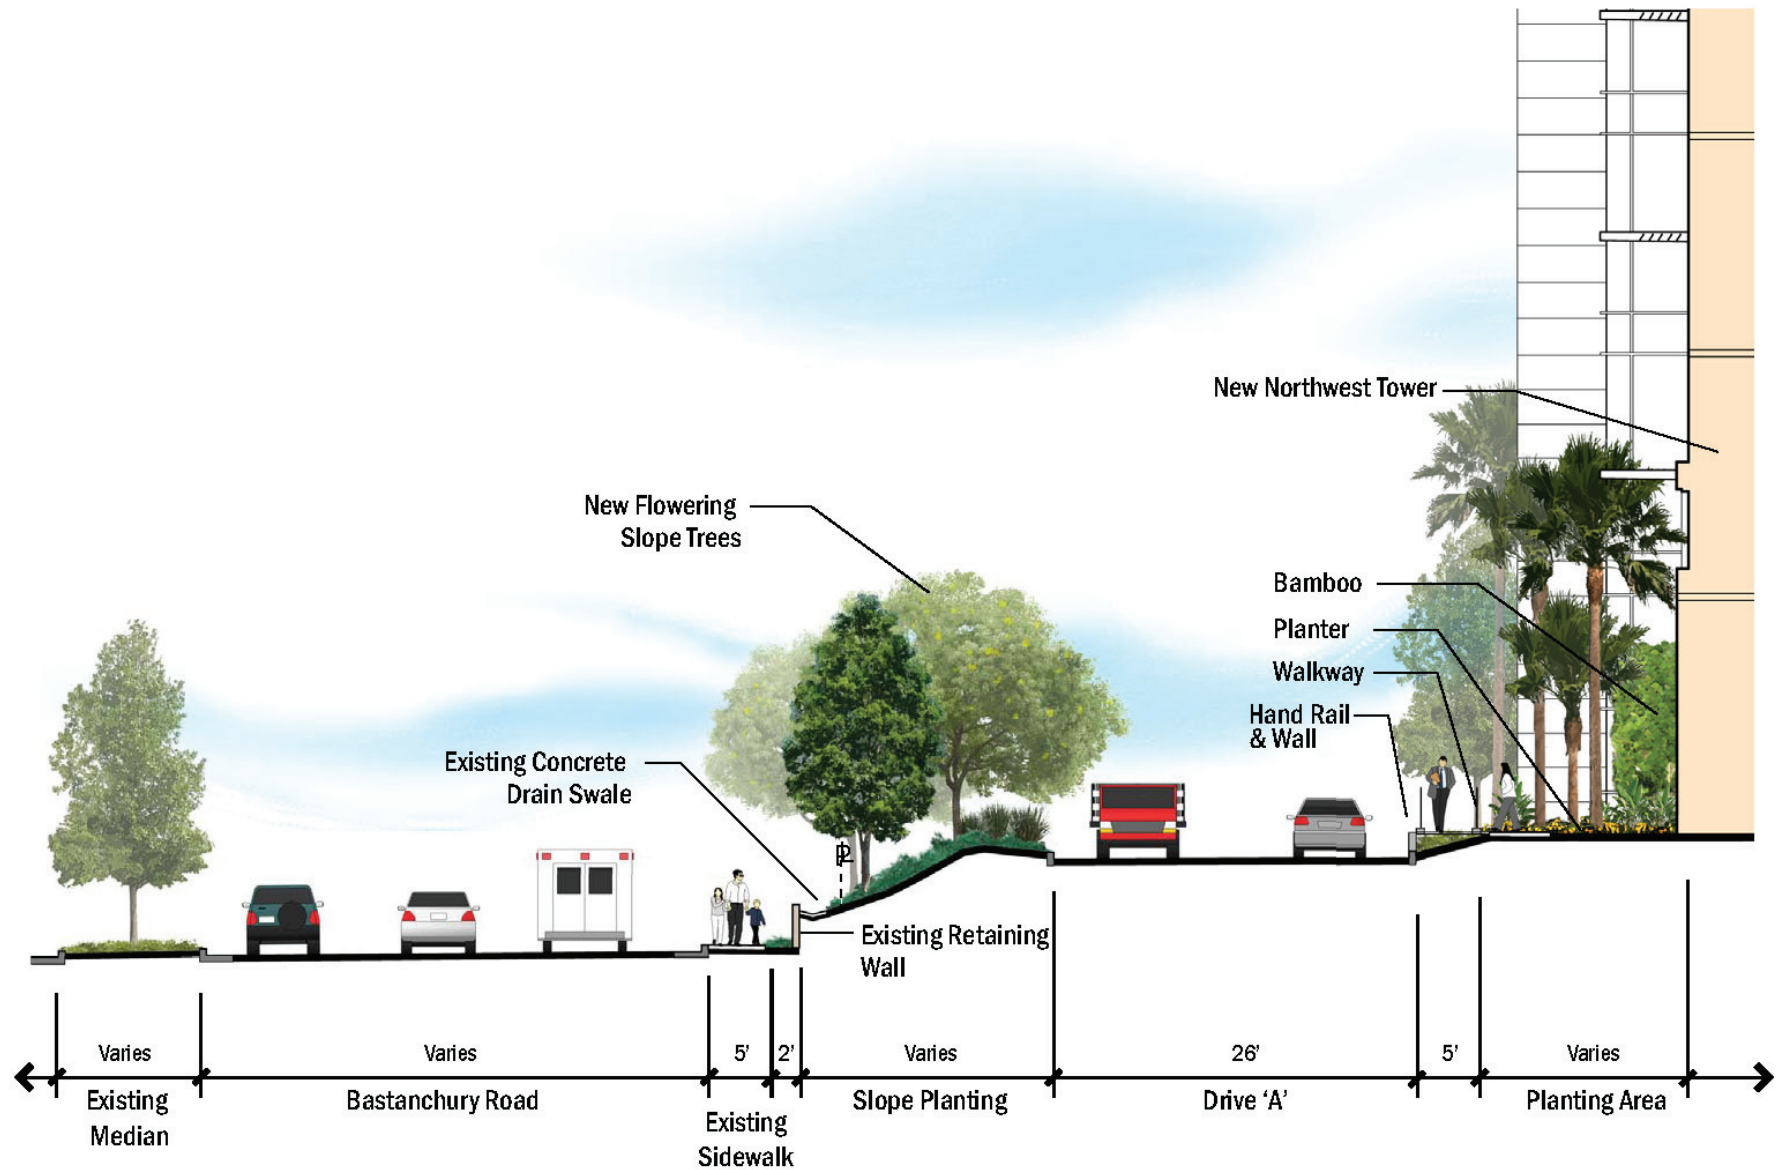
, Streetscape - Drive "A" at Northwest Tower
